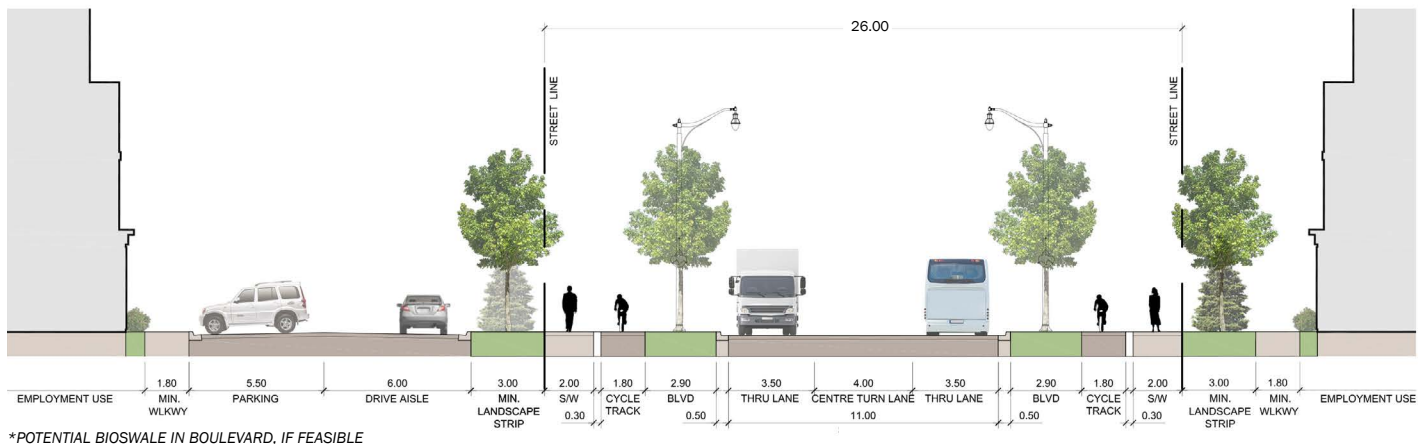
26.0m Collector Street “C” Cross Section through Employment Area.
